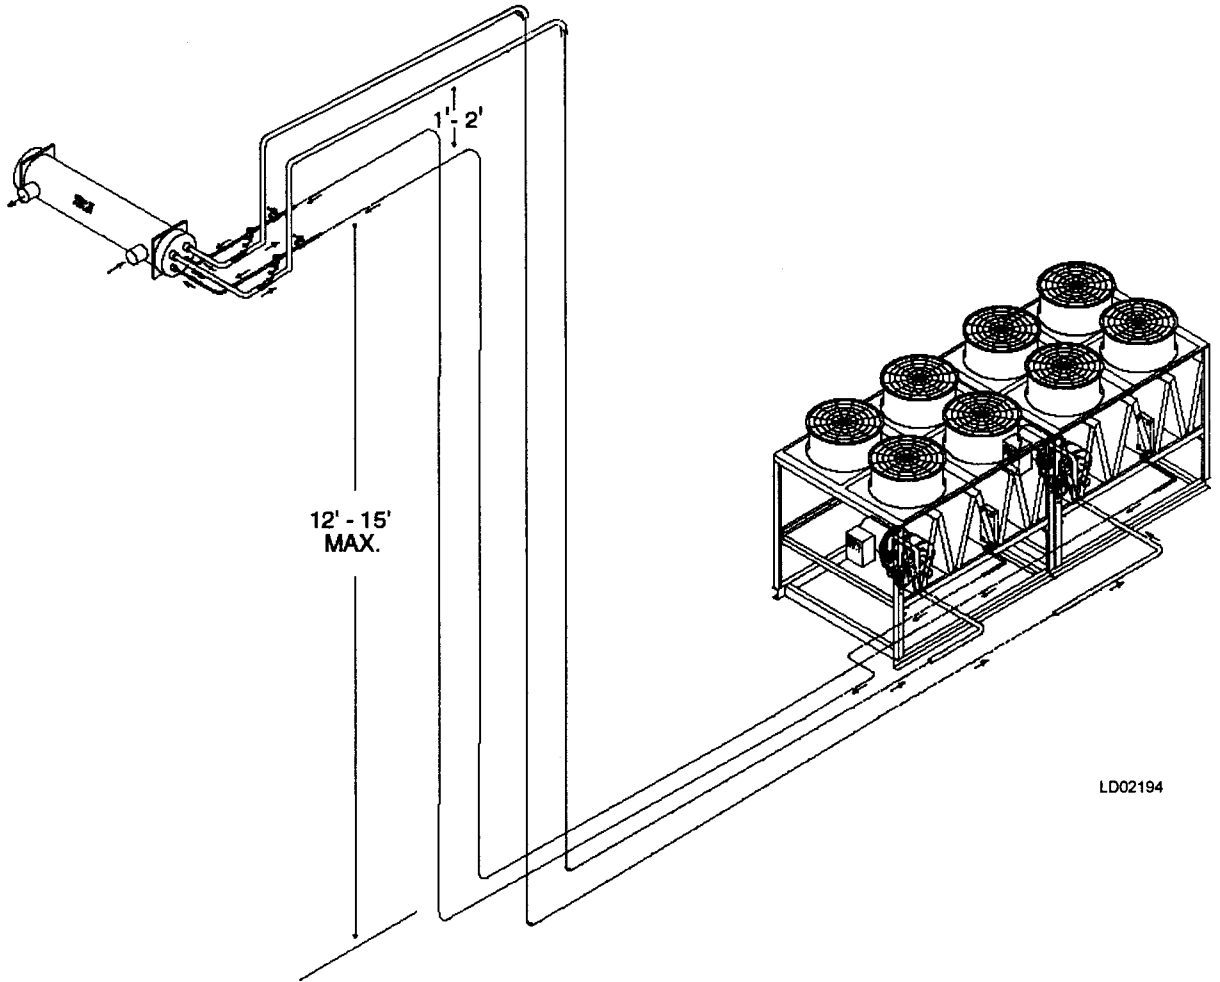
DX COOLER BELOW THE OUTDOOR SECTION
